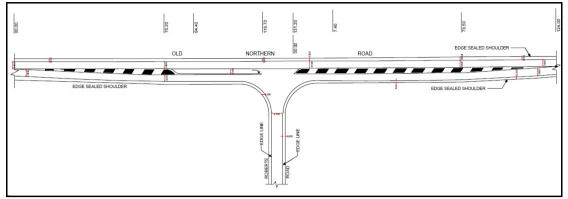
Existing layout of the intersection of Roberts Road with Old Northern Road (refer Figure
